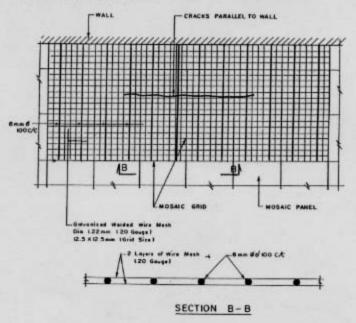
Typical arrangement of reinforcement for horizontal crack repair
